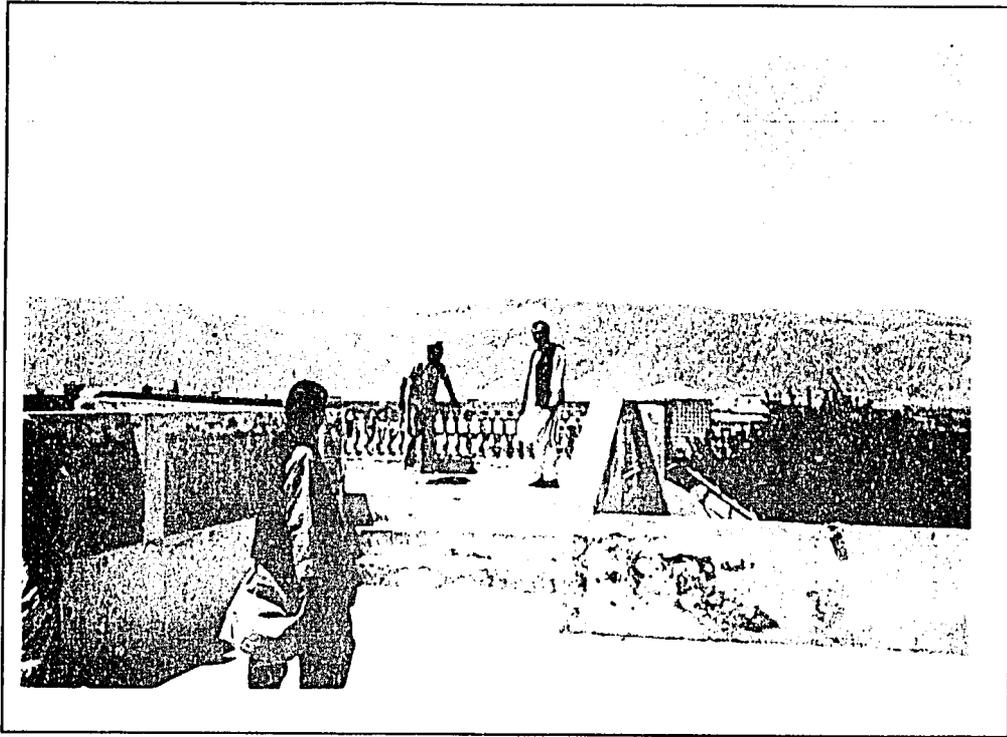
Quetta AID/REP Office Facility. Front section of roof facing West.
